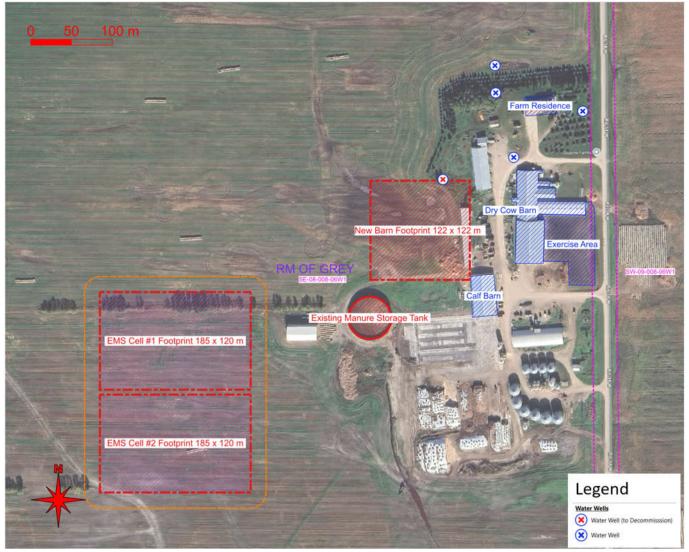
Divorne Farms SE-08-008-06WPM Site 1 Plan
